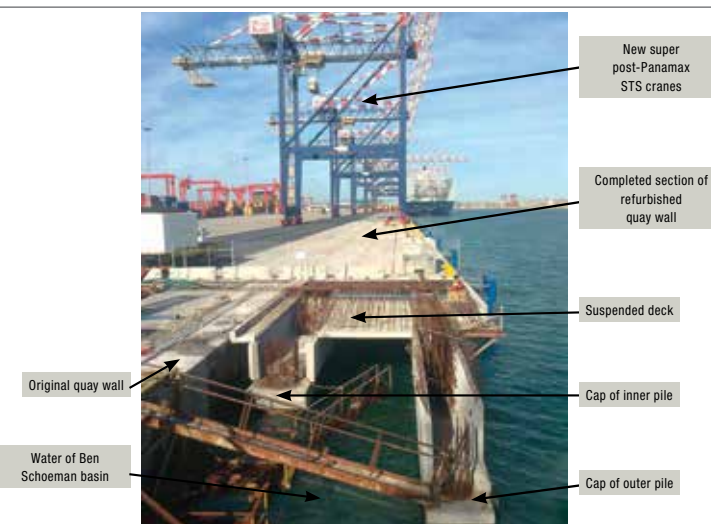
New suspended deck at the Cape Town container terminal Berth 603 (Source: Ben Schoeman Project June 2011)
